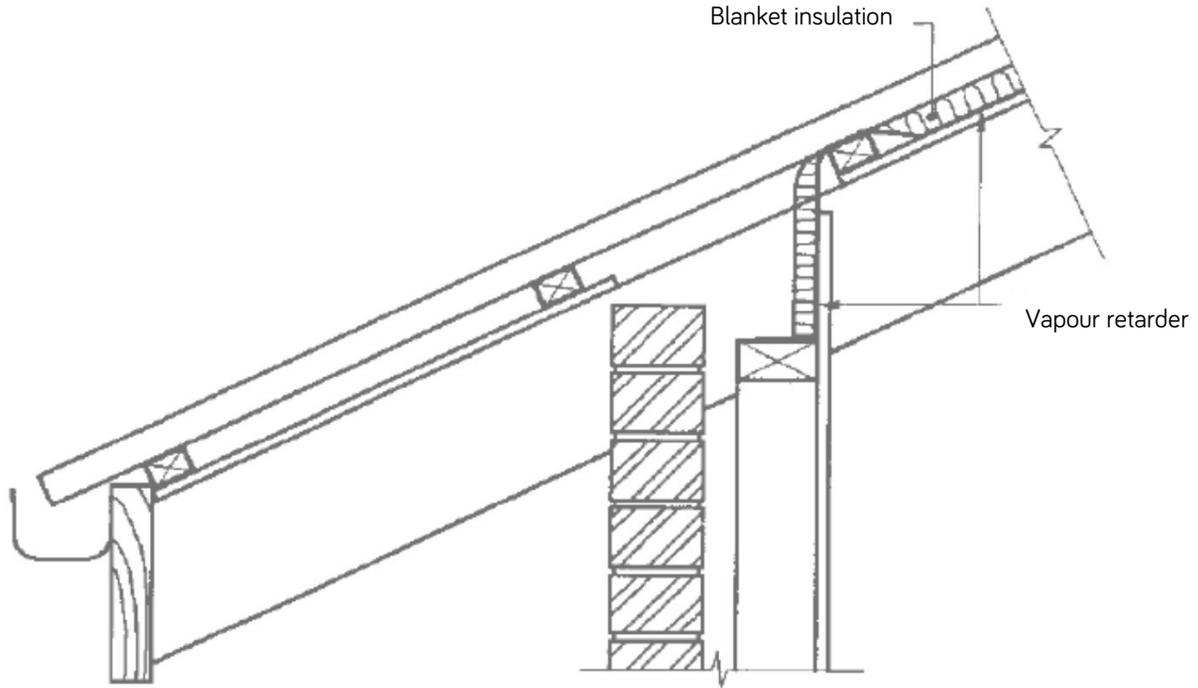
Insulation of sloping ceiling with pitched, metal roof and exposed beams.
